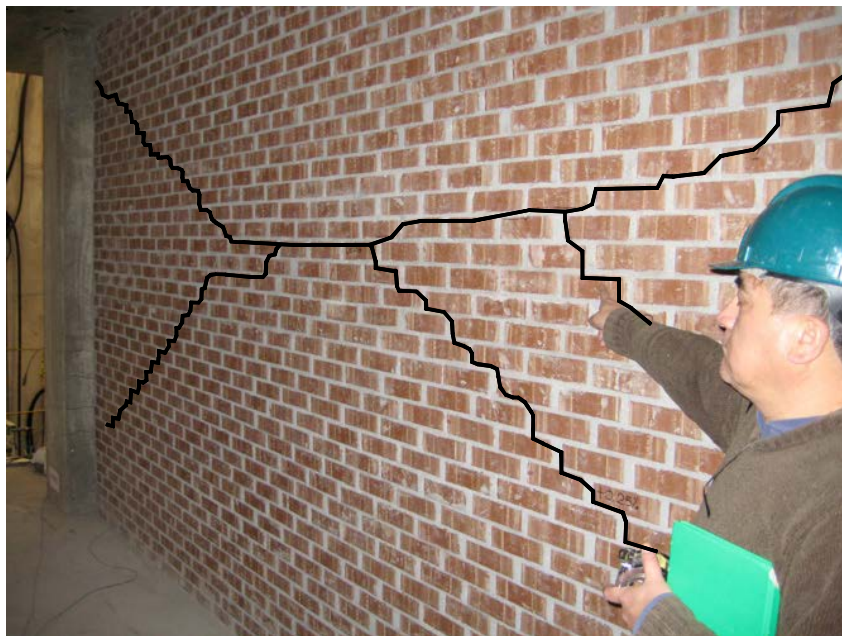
Masonry infill cracks in a full-scale building test showing crack formation at a 0.25% drift ratio
